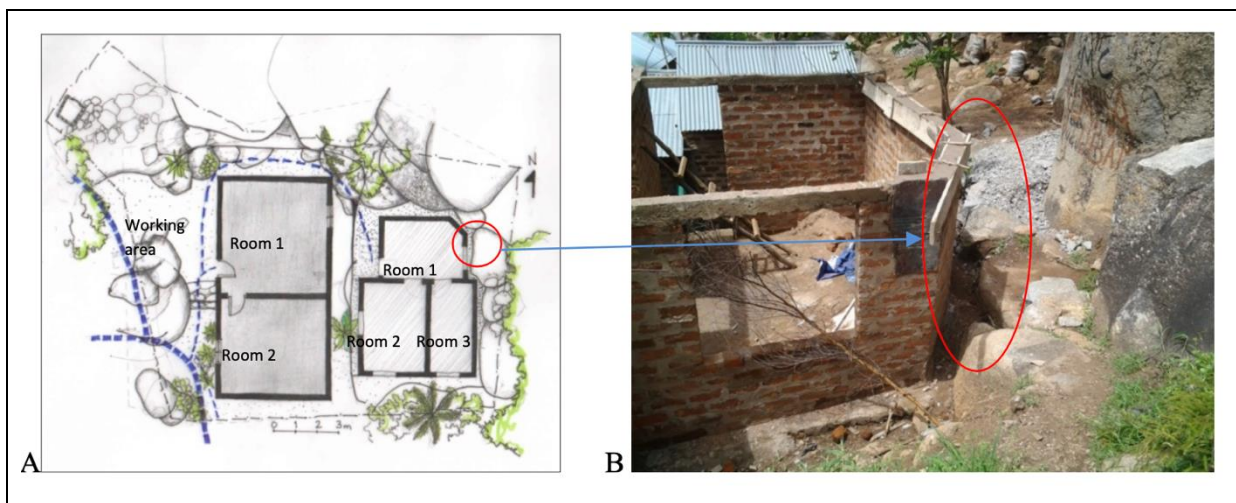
A and B: Wall of house adapted/ to the undulated rock for the new building. Author's fieldwork study 2025
